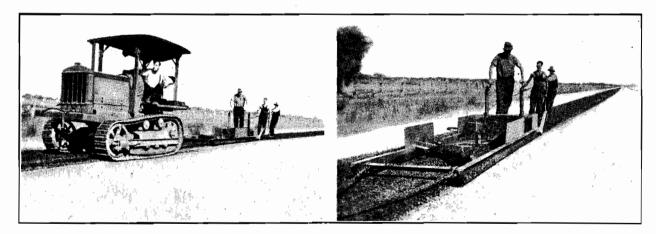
and 17.—Rolling mixed material on half of finished pavement on the Hume Highway at Bowser.
